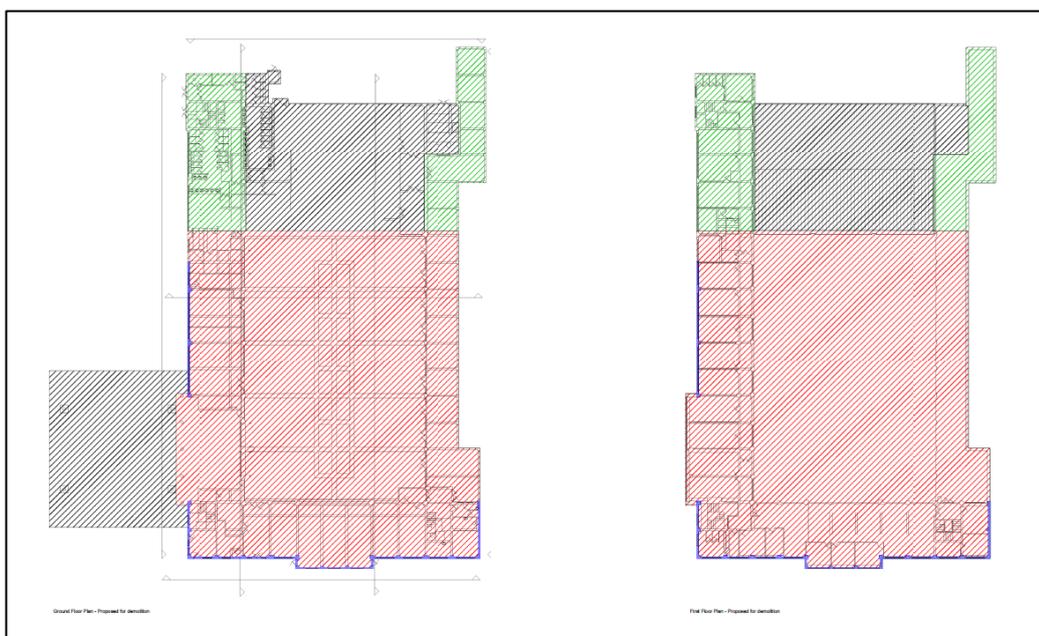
Extract from Consented Demolition Plan (Areas for Demolition in Red, Green, and Grey)¹⁸
